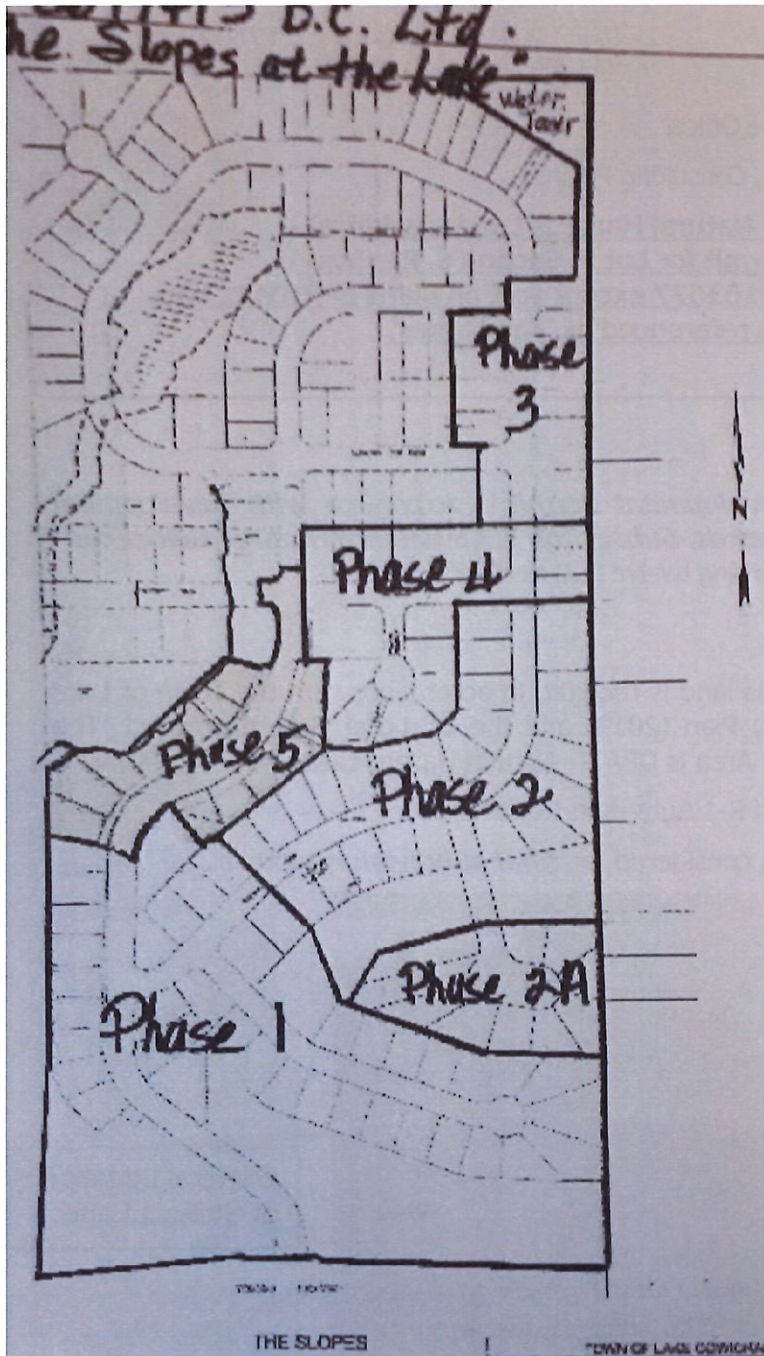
Plan of Subdivision, Phase 5 Highlighted
